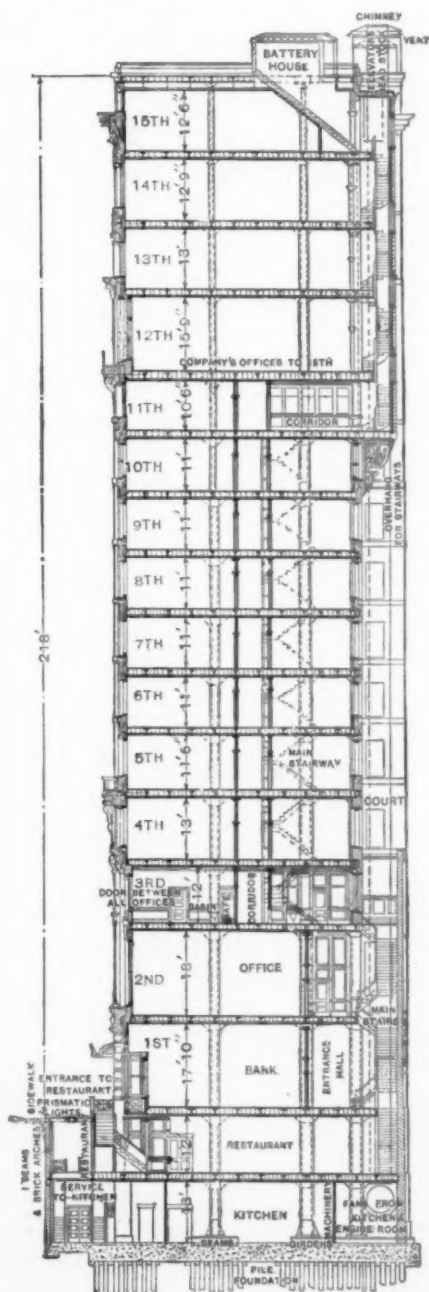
SECTIONAL ELEVATION OF THE R. G. DUN Co.'s BUILDING.
